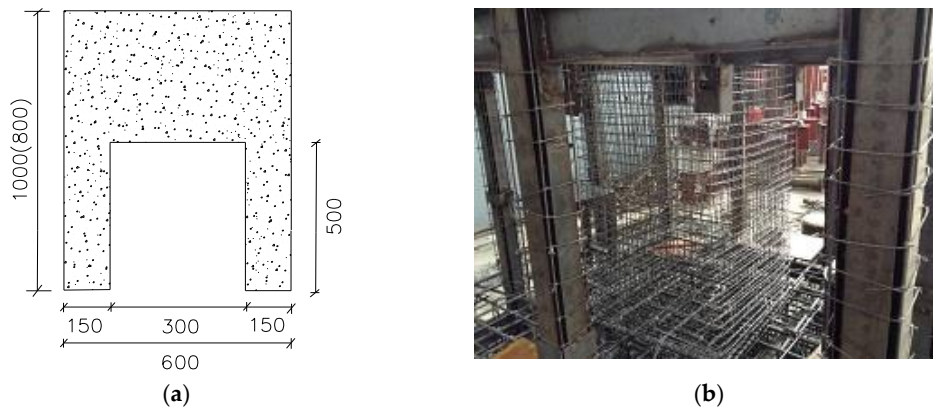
(a) Shear wall with an opening; (b) details of Shear wall (unit: mm).
